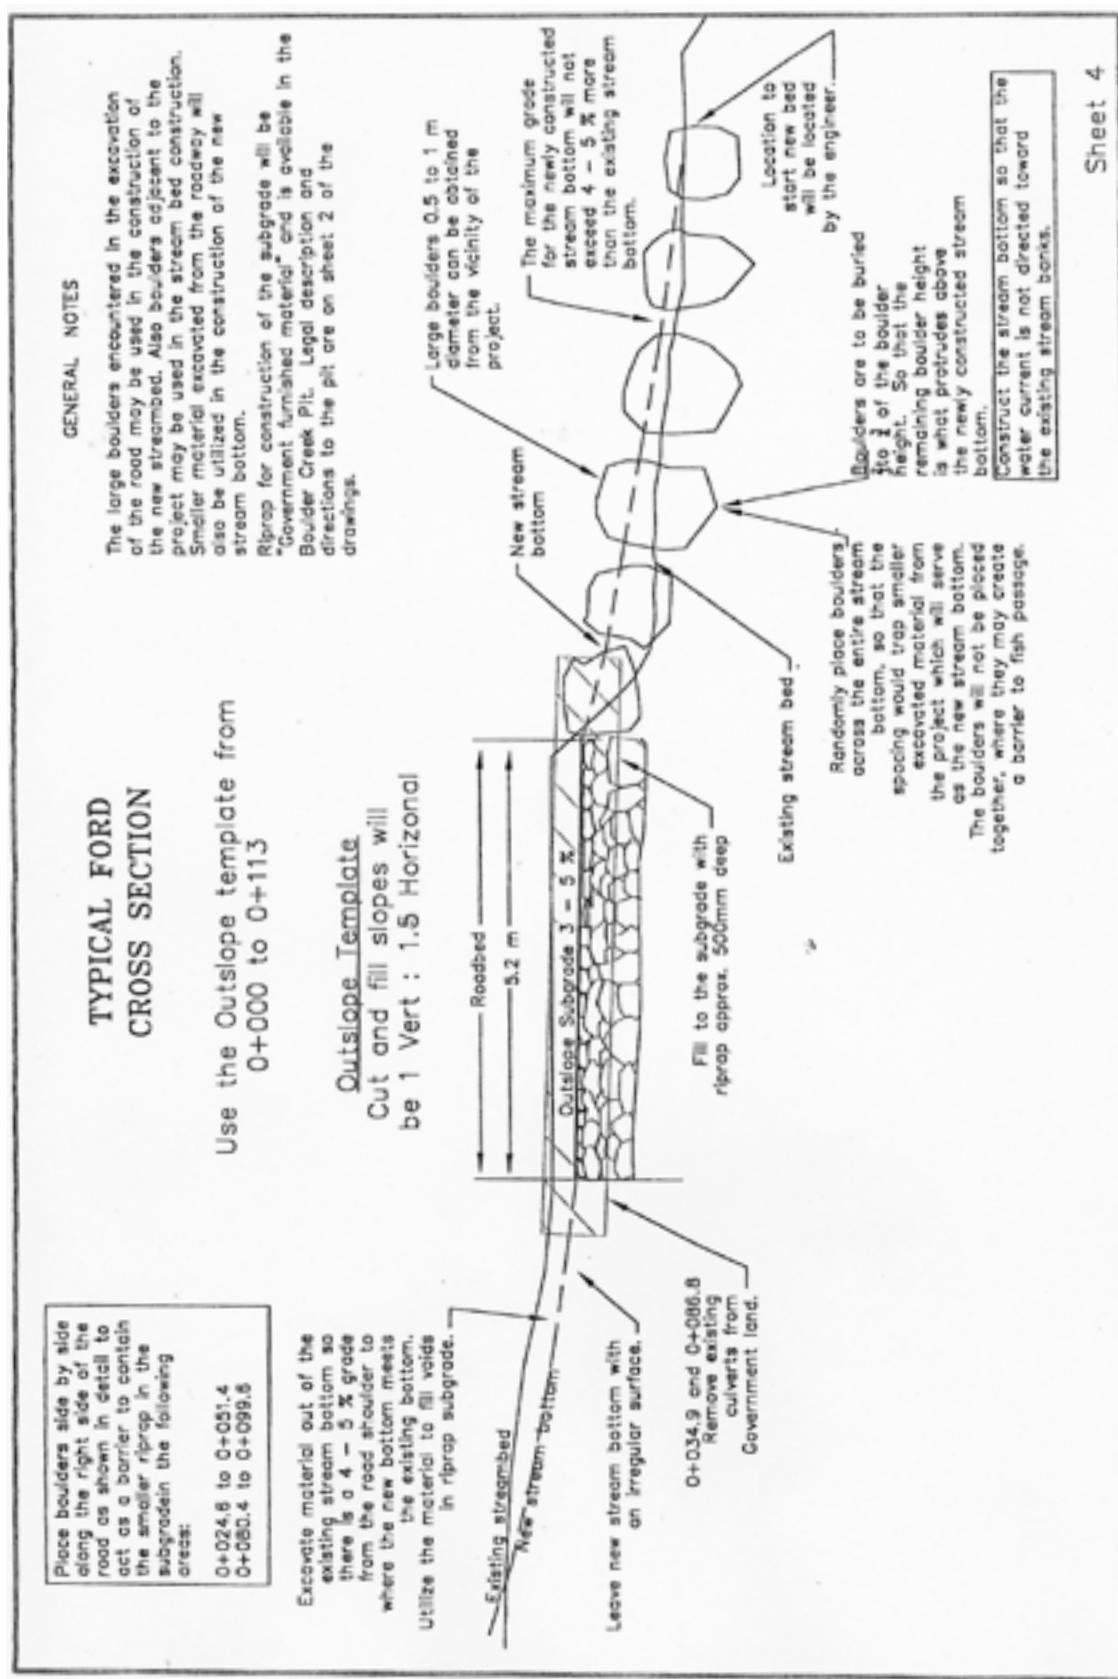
Cross-section drawings. A full size drawing may be found on the CD included in the back of this publication.
